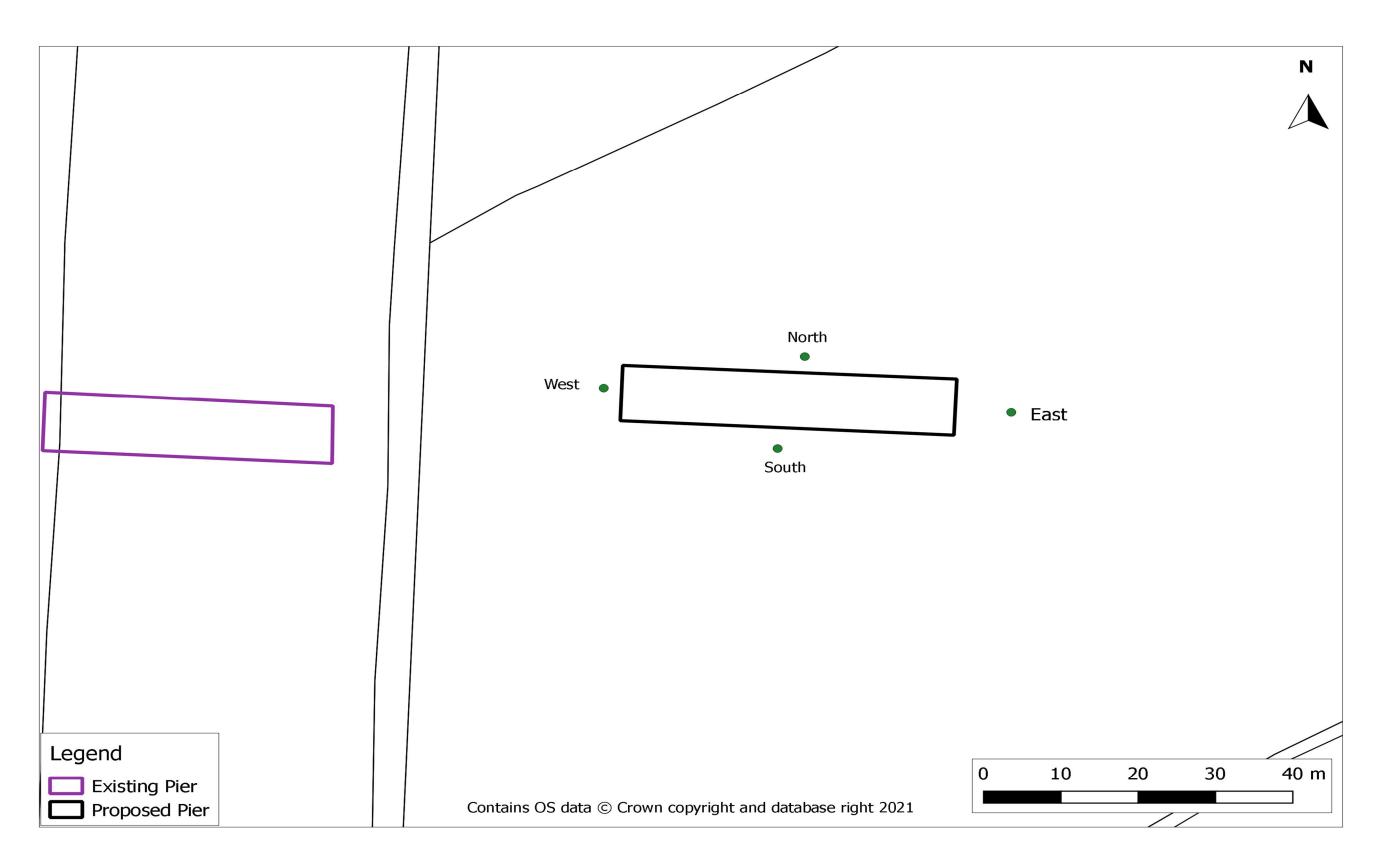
Proposed South Pier Inspection Locations
